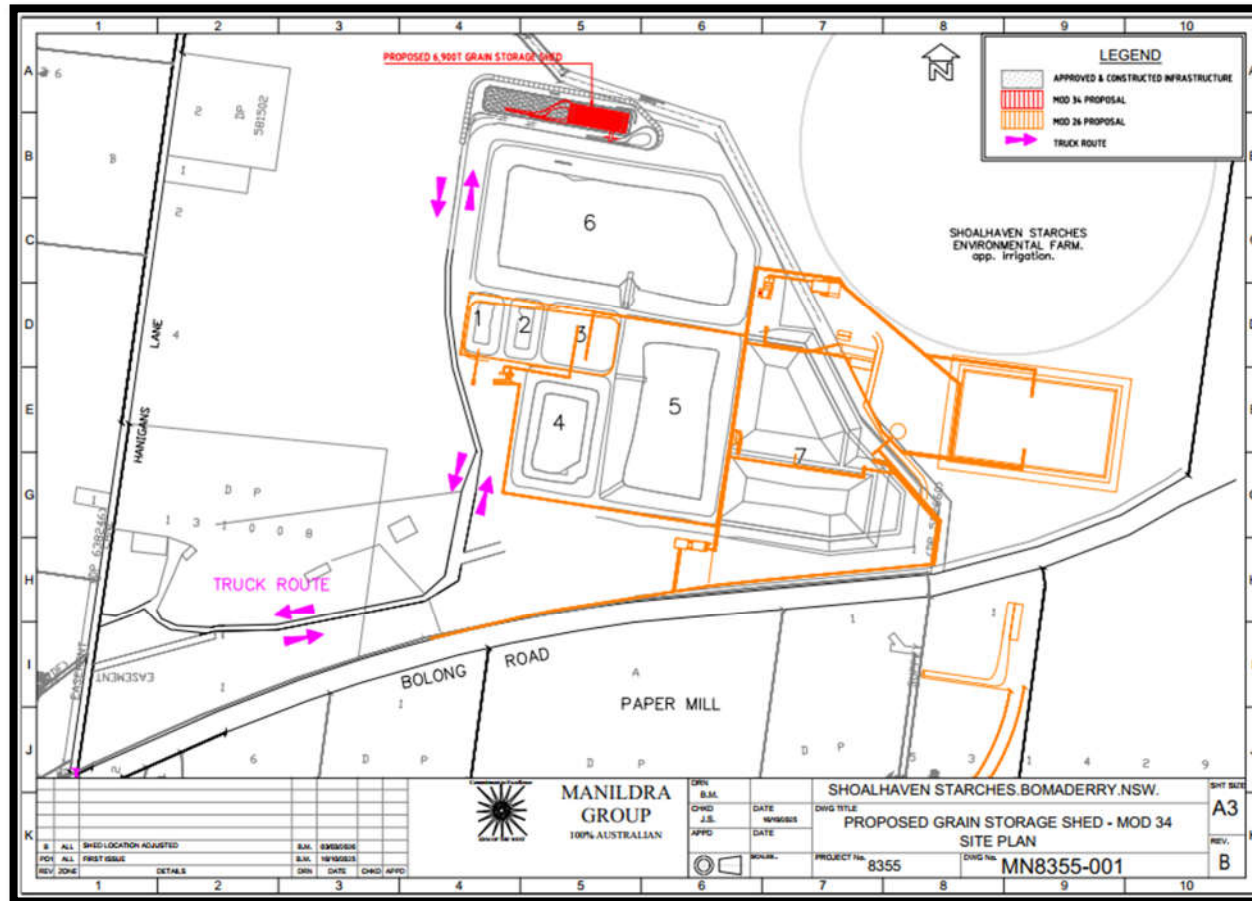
Overall Site Plan of proposed works associated with Modification Application (Source: Shoalhaven Starches Pty Ltd)
